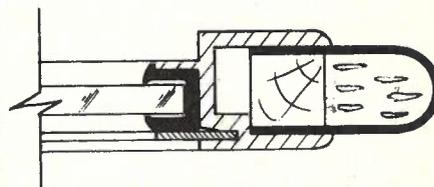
Section Through Door style showing "Neoprene" Glazing Strip Rubber and Buffer Strip.
